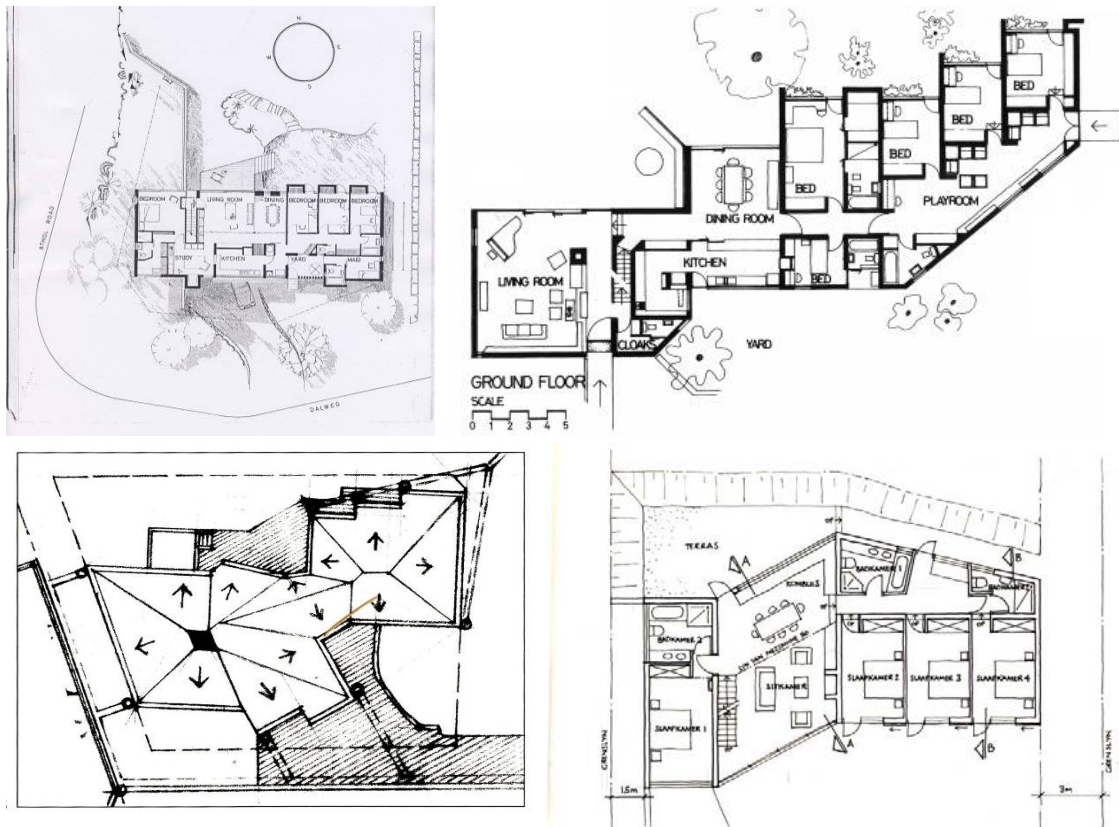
Previous page left: House Keurbos, Newlands (1951) (Author, 2009). Previous page right: House Levin, Langebaan (1969) (Author, 2009). Top left: Plan, House Bertie-Roberts (1966) (Anon, 1968:12). Top right: Ground floor plan, House Raynham (1967) (Fagan, 2005:52). Bottom left: Roof plan, House Neethling, Durbanville (1985) (Fagan, 2005:82). Bottom right: Ground floor plan, House J.J. Fagan, McGregor (2005) (Fagan archive - Job No. 0508, undated).
